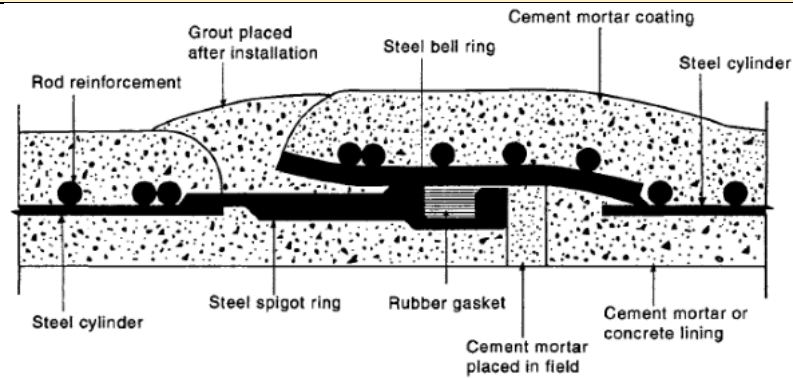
Bell-and-spigot joint used in Pretension concrete cylinder pipe
